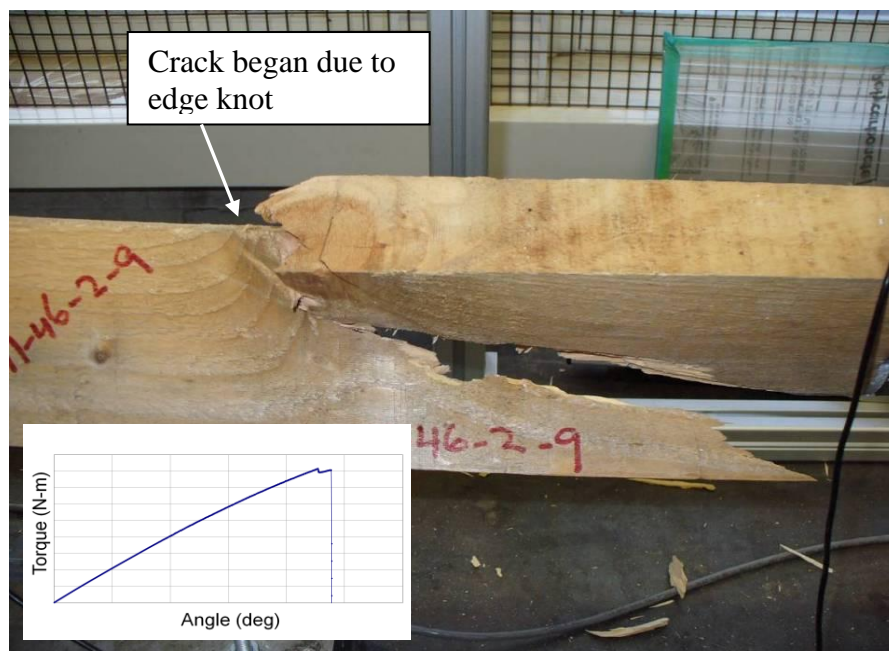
A typical shear failure began due to an edge knot in 2.8m joist
